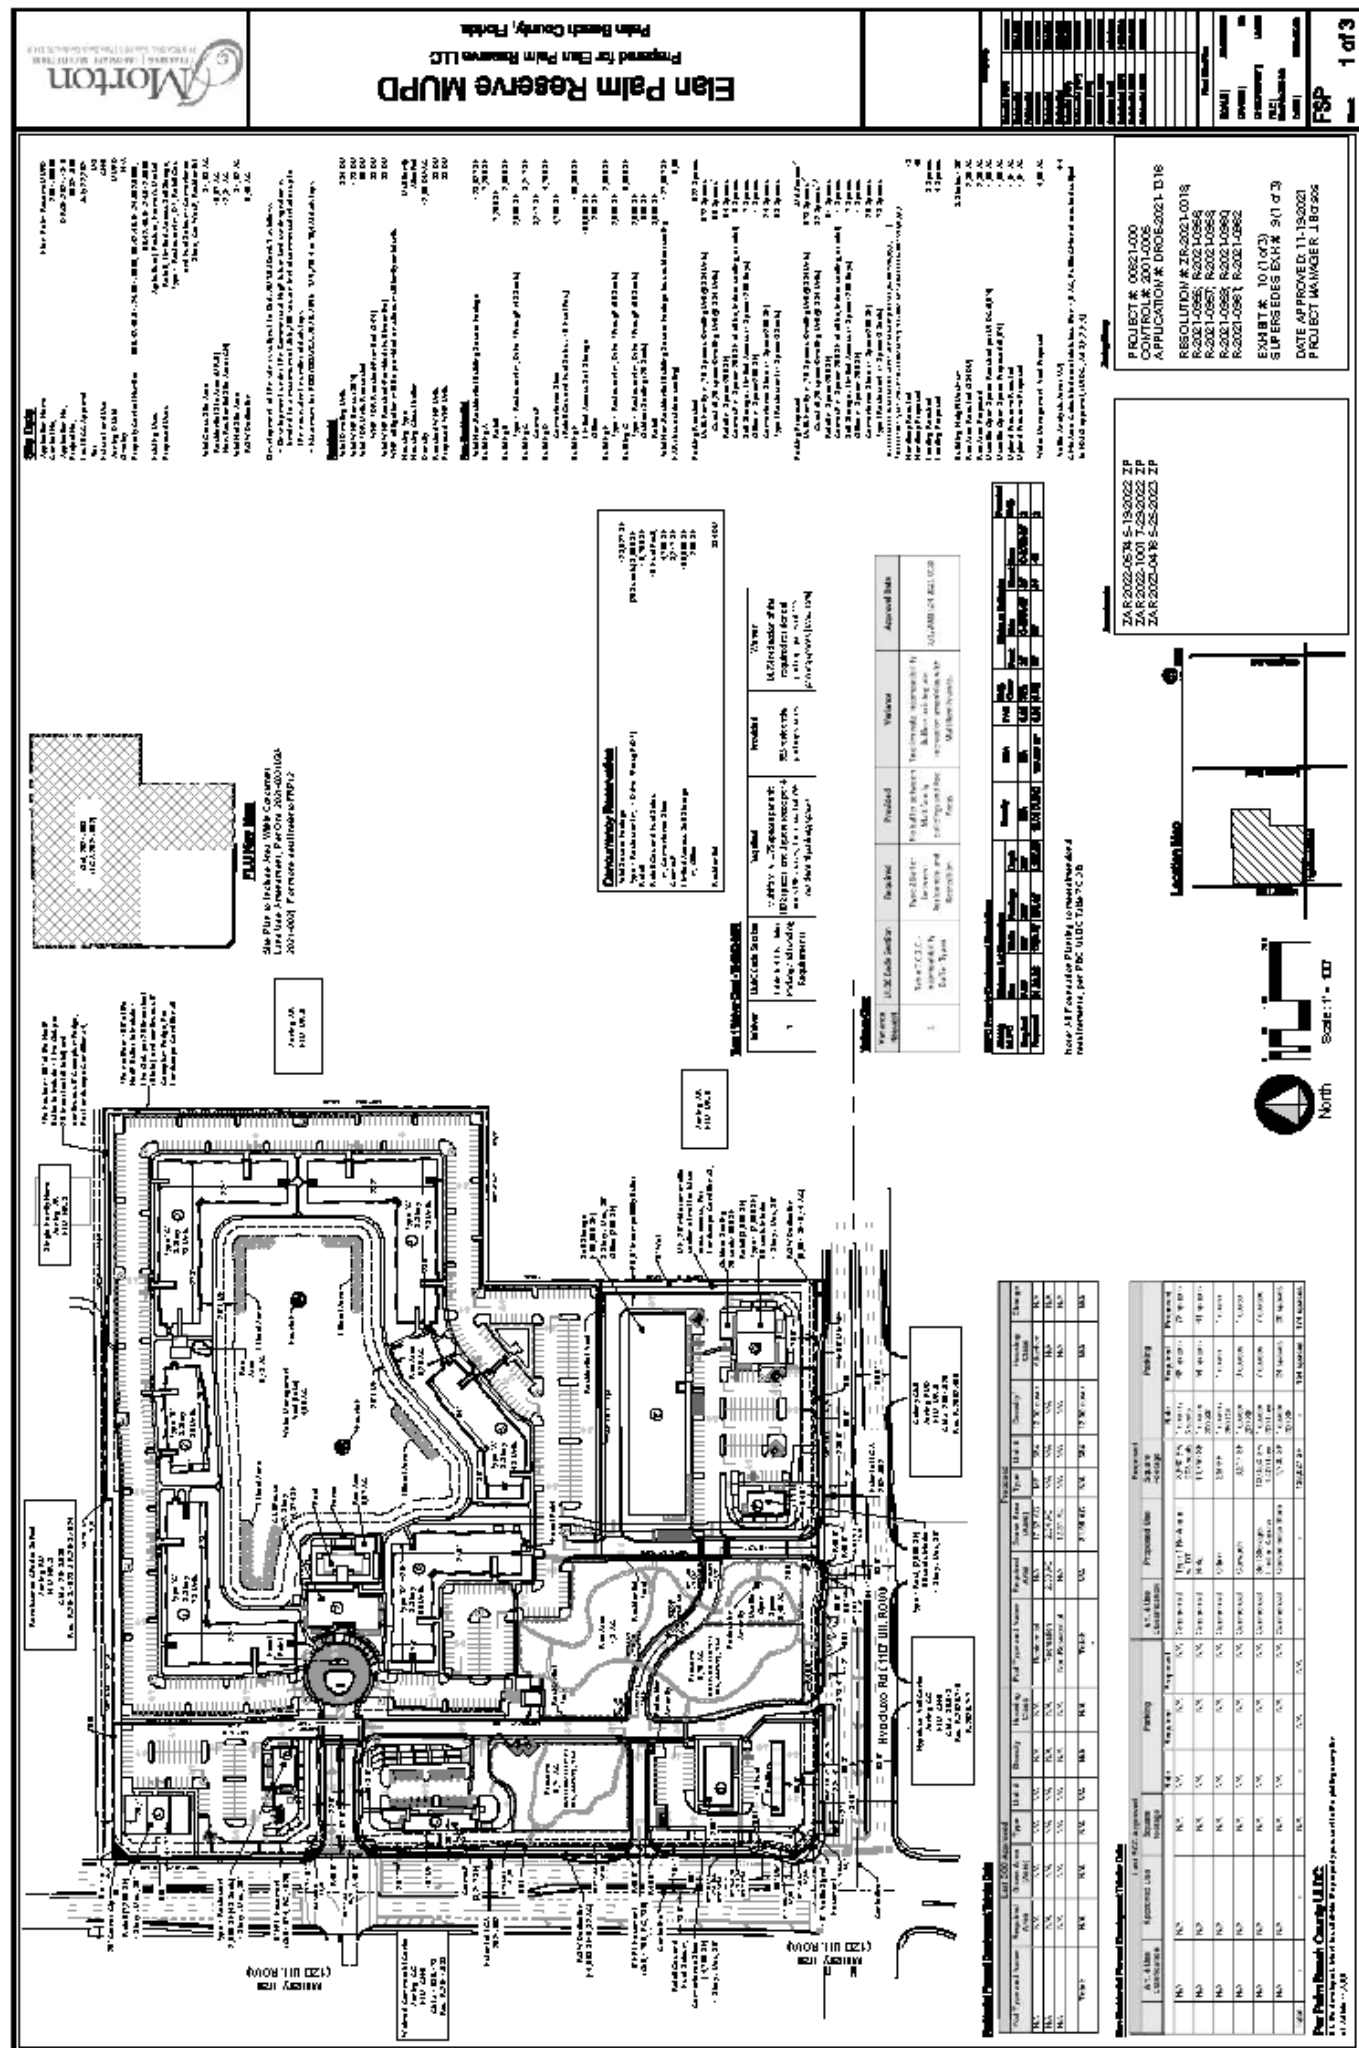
Aprproved Final Site Plan dated May 25, 2023 (page 2 of 3)
